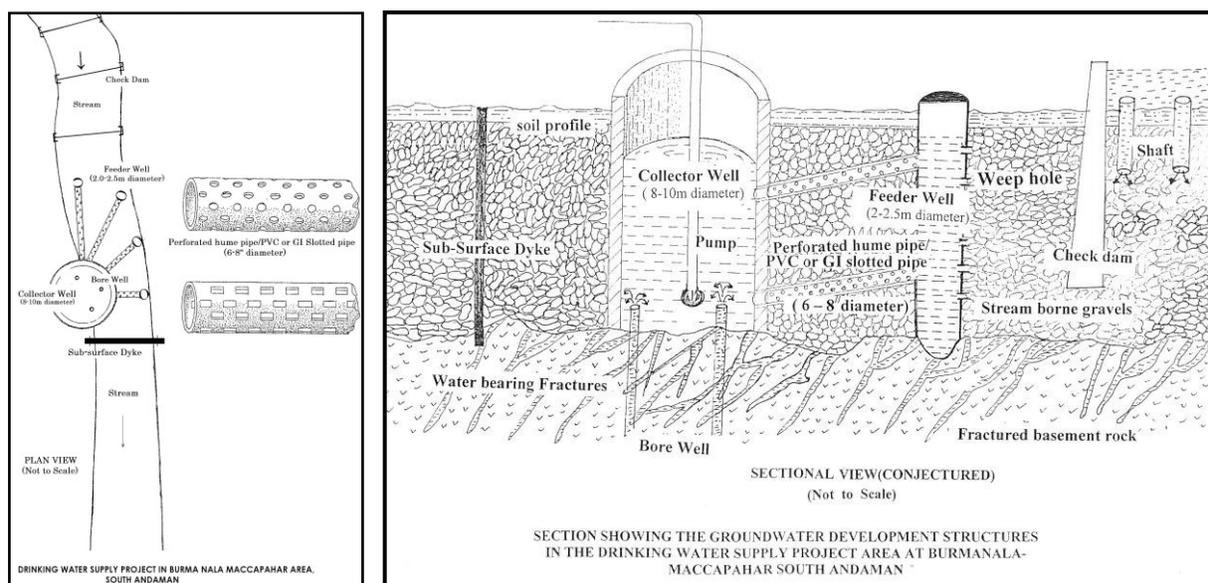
Plan and section of MaccaPahar-Burma Nala water supply project in the post tsunami
